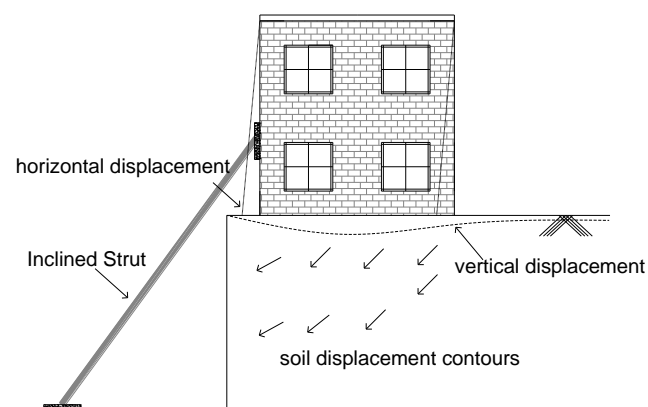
Schematic figure of 'inclined strut' method and excavation effects on buildings
